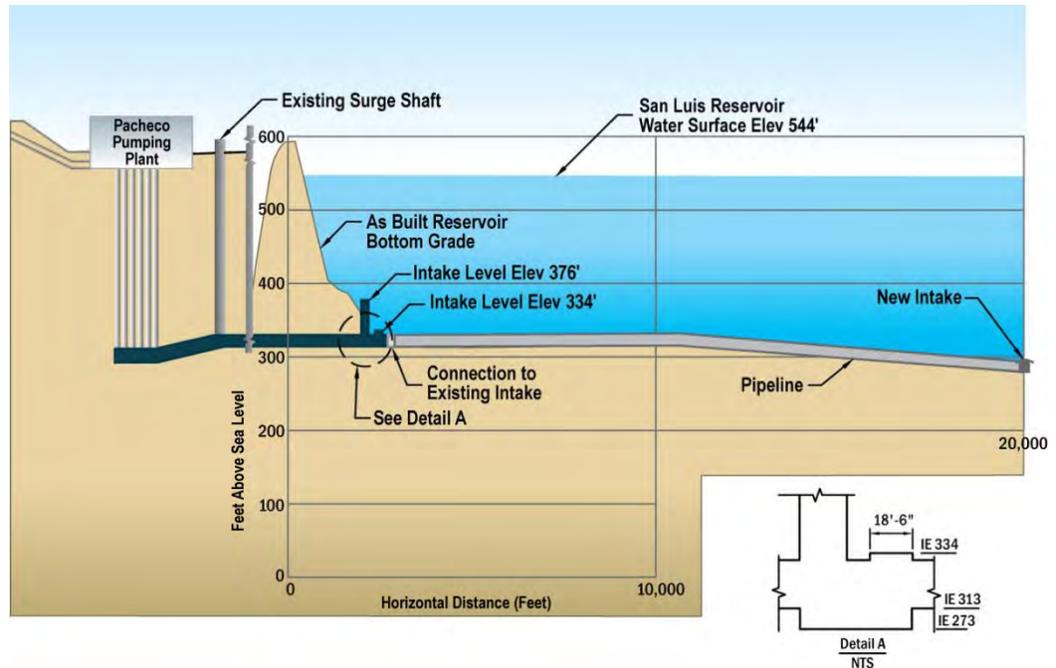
Lower San Felipe Intake Alternative Plan Pipeline Profile
